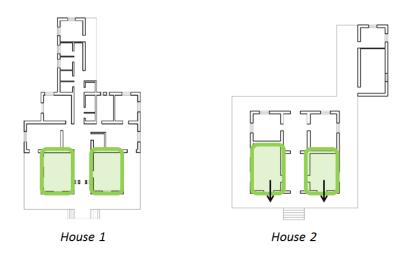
Studying and drawing rooms in House 1 and House 2 (Author, 2012)
